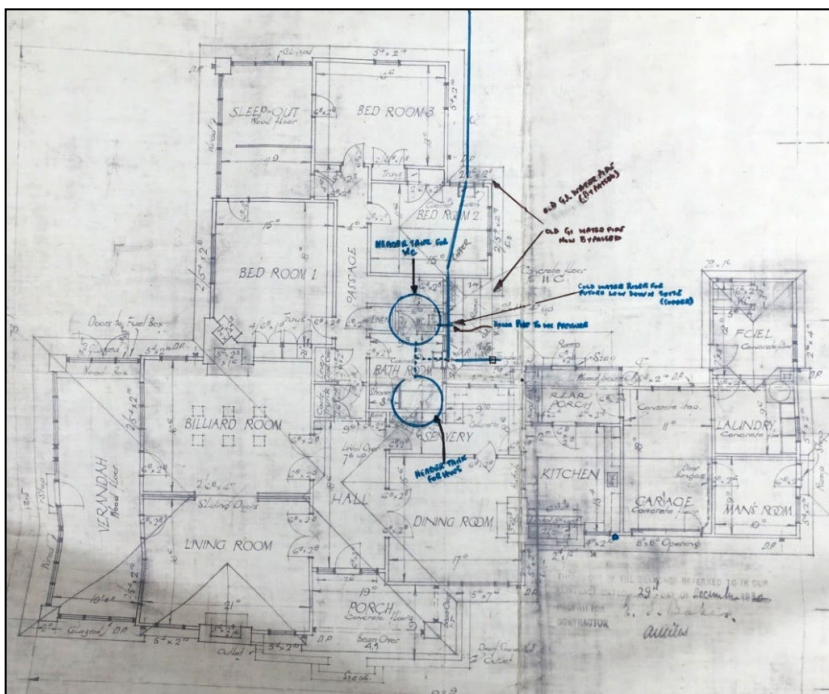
Ground floor plan (North is down). Drawing by architects Oakley & Parkes, dated December 1930 (2018 owner's collection).
